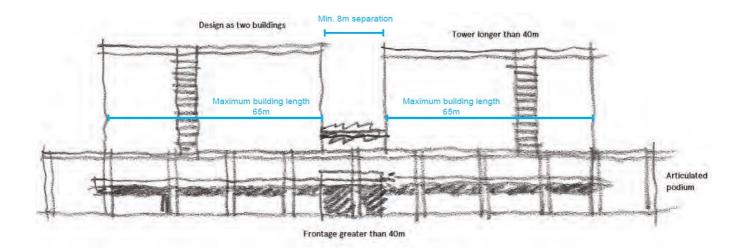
Building length controls for greater than 65 metre wide street frontages
